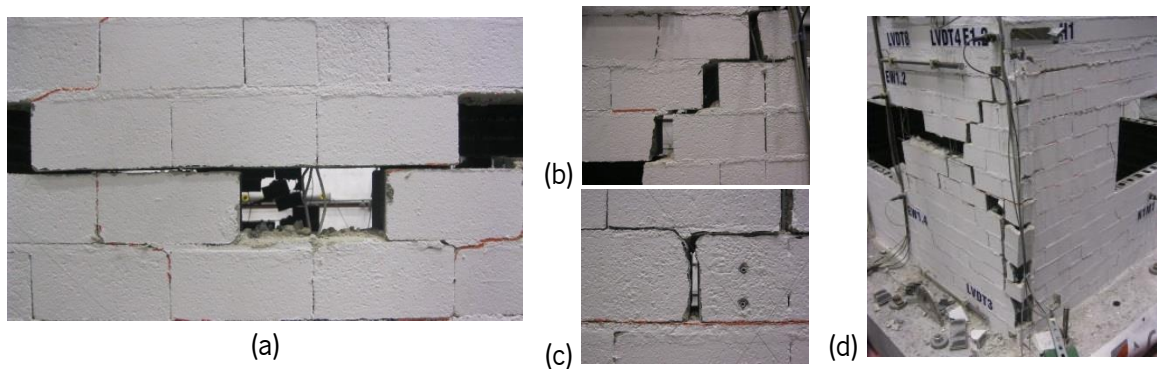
Lost of mortar joints at the first floor of the east wall: (a) left pier of the window; (b, c and d) right pier of the window
